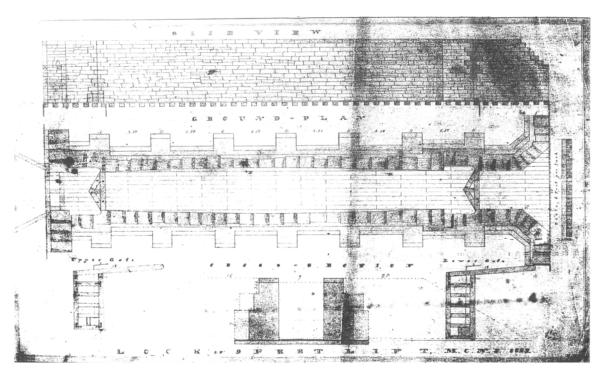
1823 Plan, Elevation, and Sectional Diagram of Original Typical Lock Construction. (The Canal Society of New Jersey)
